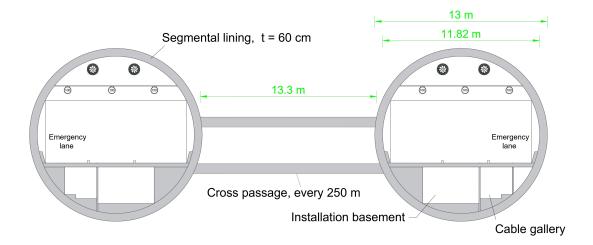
Cross section of double-tube bored tunnels with emergency lane
